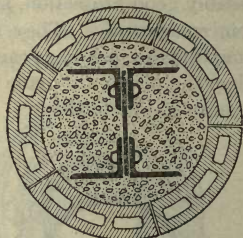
Circular Terra-Cotta and Concrete Column Protection.
